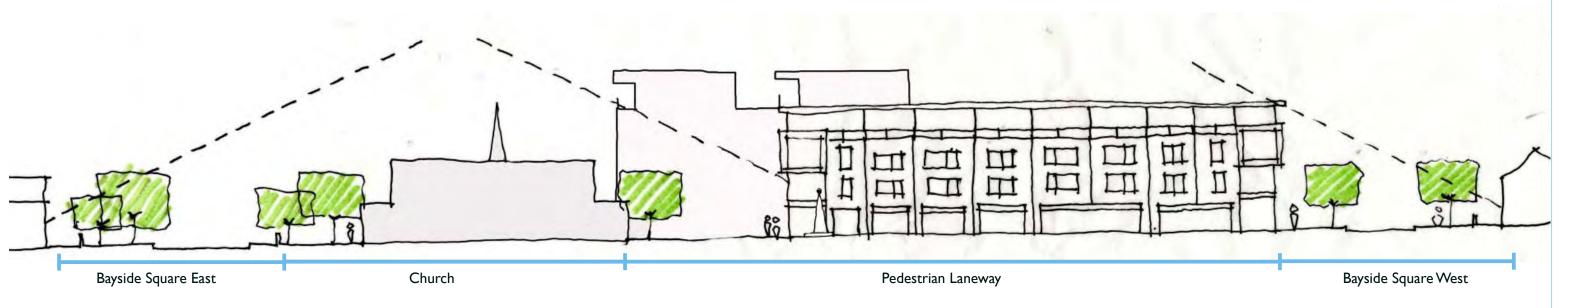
Elevation Along the Pedestrian Laneway looking south - Options 1&2
